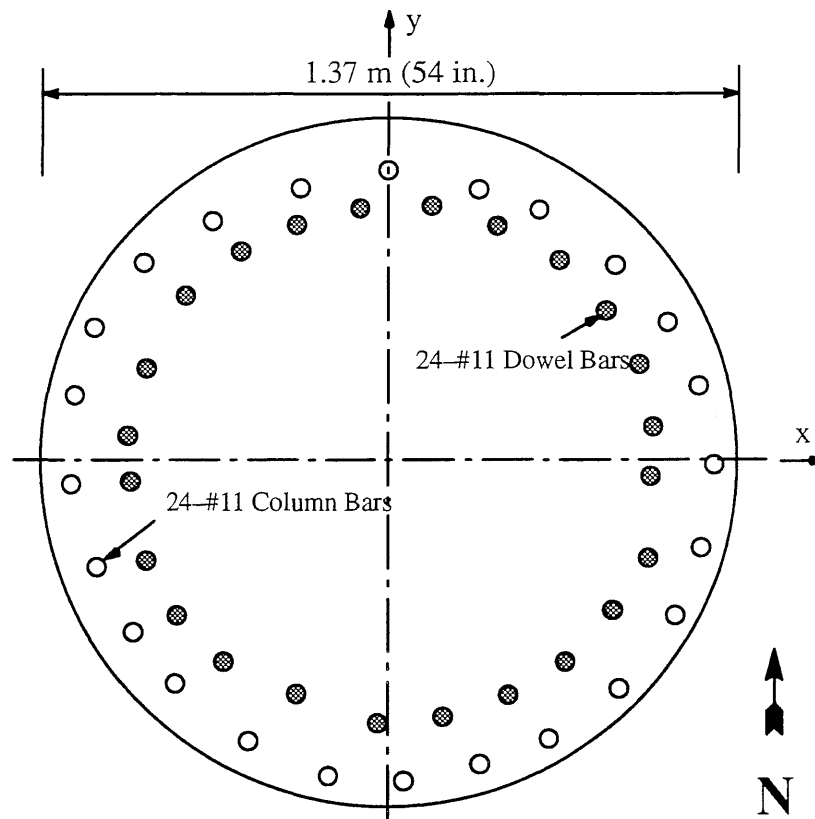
Bar Locations in 1.37 m (54 in.) Diameter Column C17S
